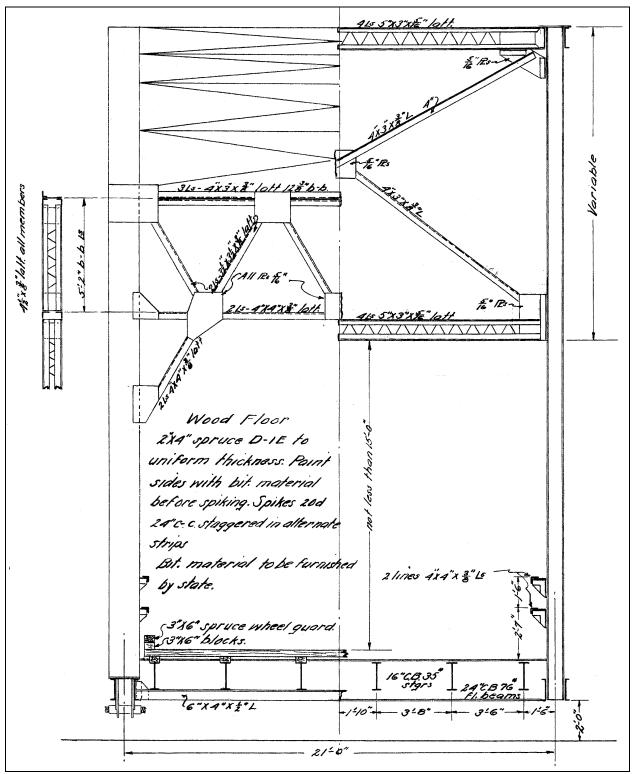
Bridge cross-section [source: original bridge drawings 1928].
